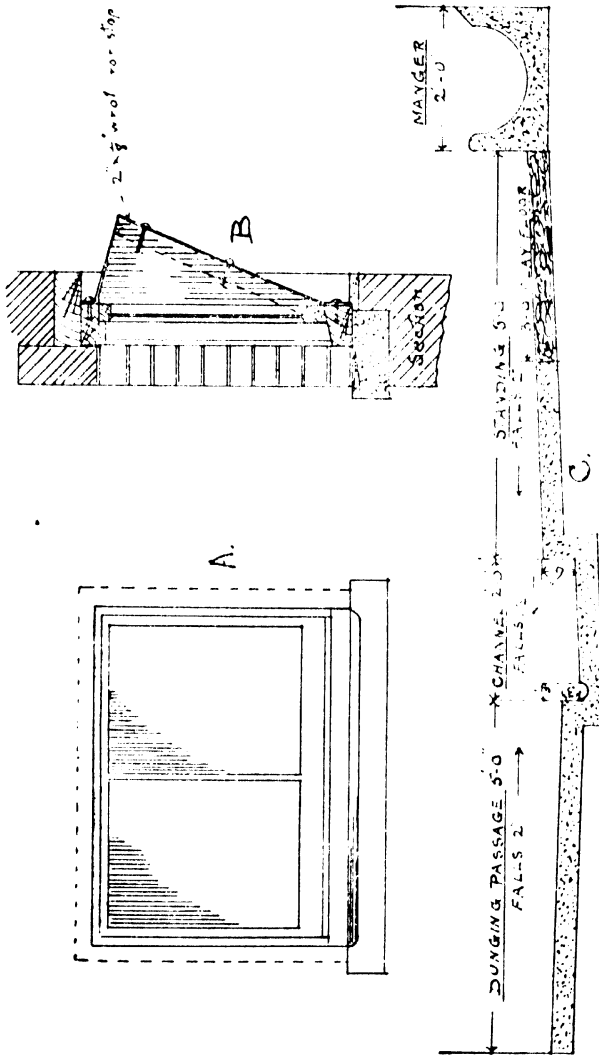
A. AND B. DETAILS OF HOPPER WINDOW. C. SECTION OF COW-HOUSE FLOOR; ONE ROW OF STALLS WITHOUT FEEDING PASSAGE.
